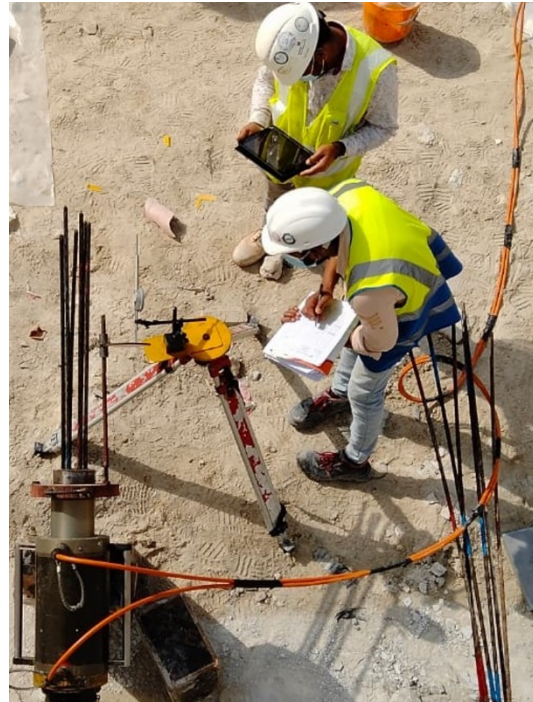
Routine anchor acceptance testing using AnchorTest on iPad at the QP Multi-storey car park.
